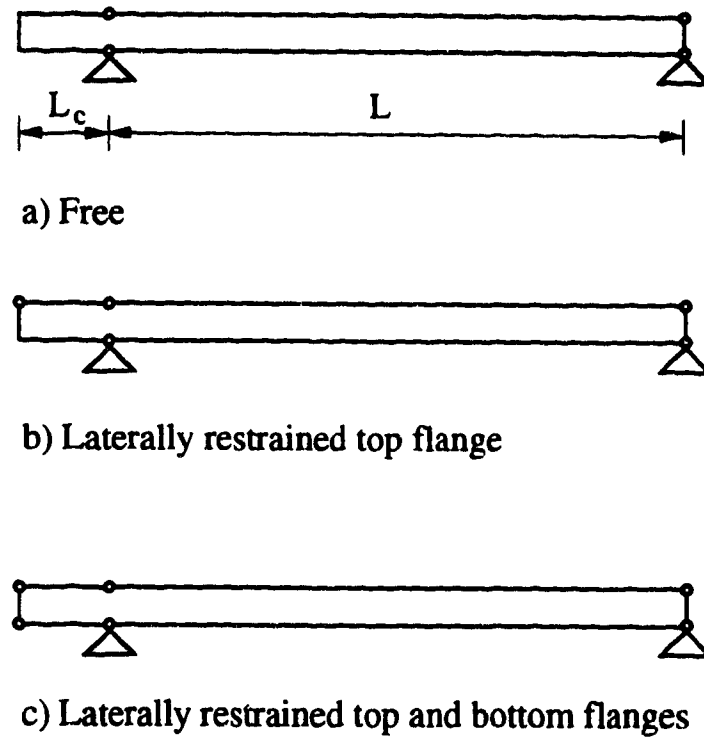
Restraint conditions at the cantilever tip of overhanging beams
